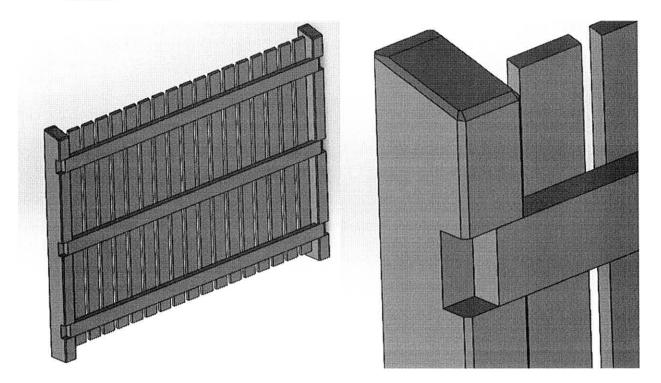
Isometric fence section rear view (left) and close-up of the post notch detail (right).
